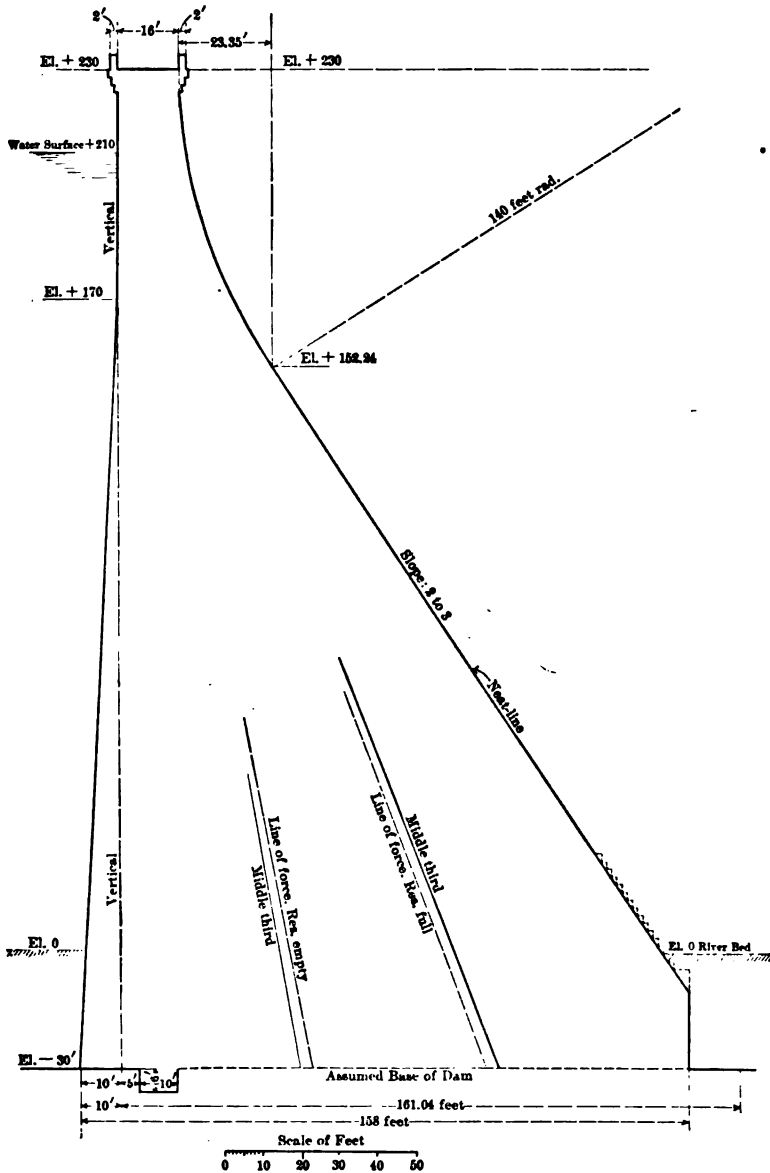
PLATE XXXIII.—Maximum Cross-section, Roosevelt Dam, Arizona.
